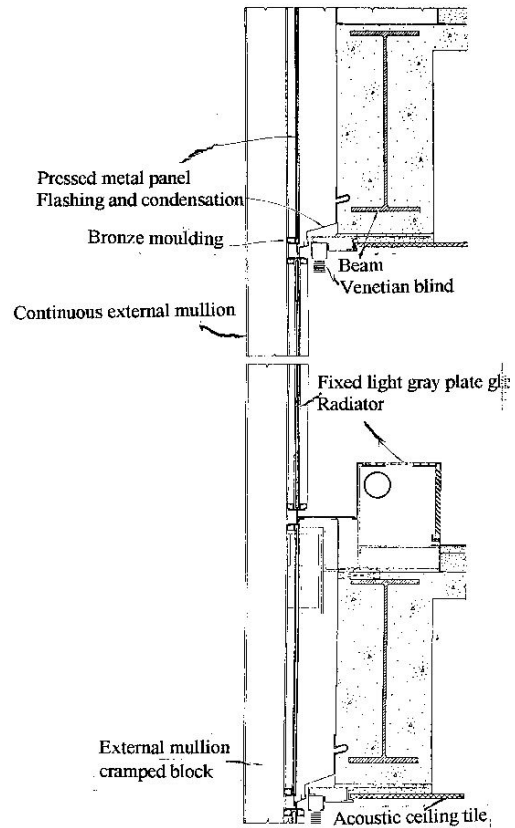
Typical section through a glass facing building in general source: best of architects' working details, 1982 approx. scale: 1:200.
